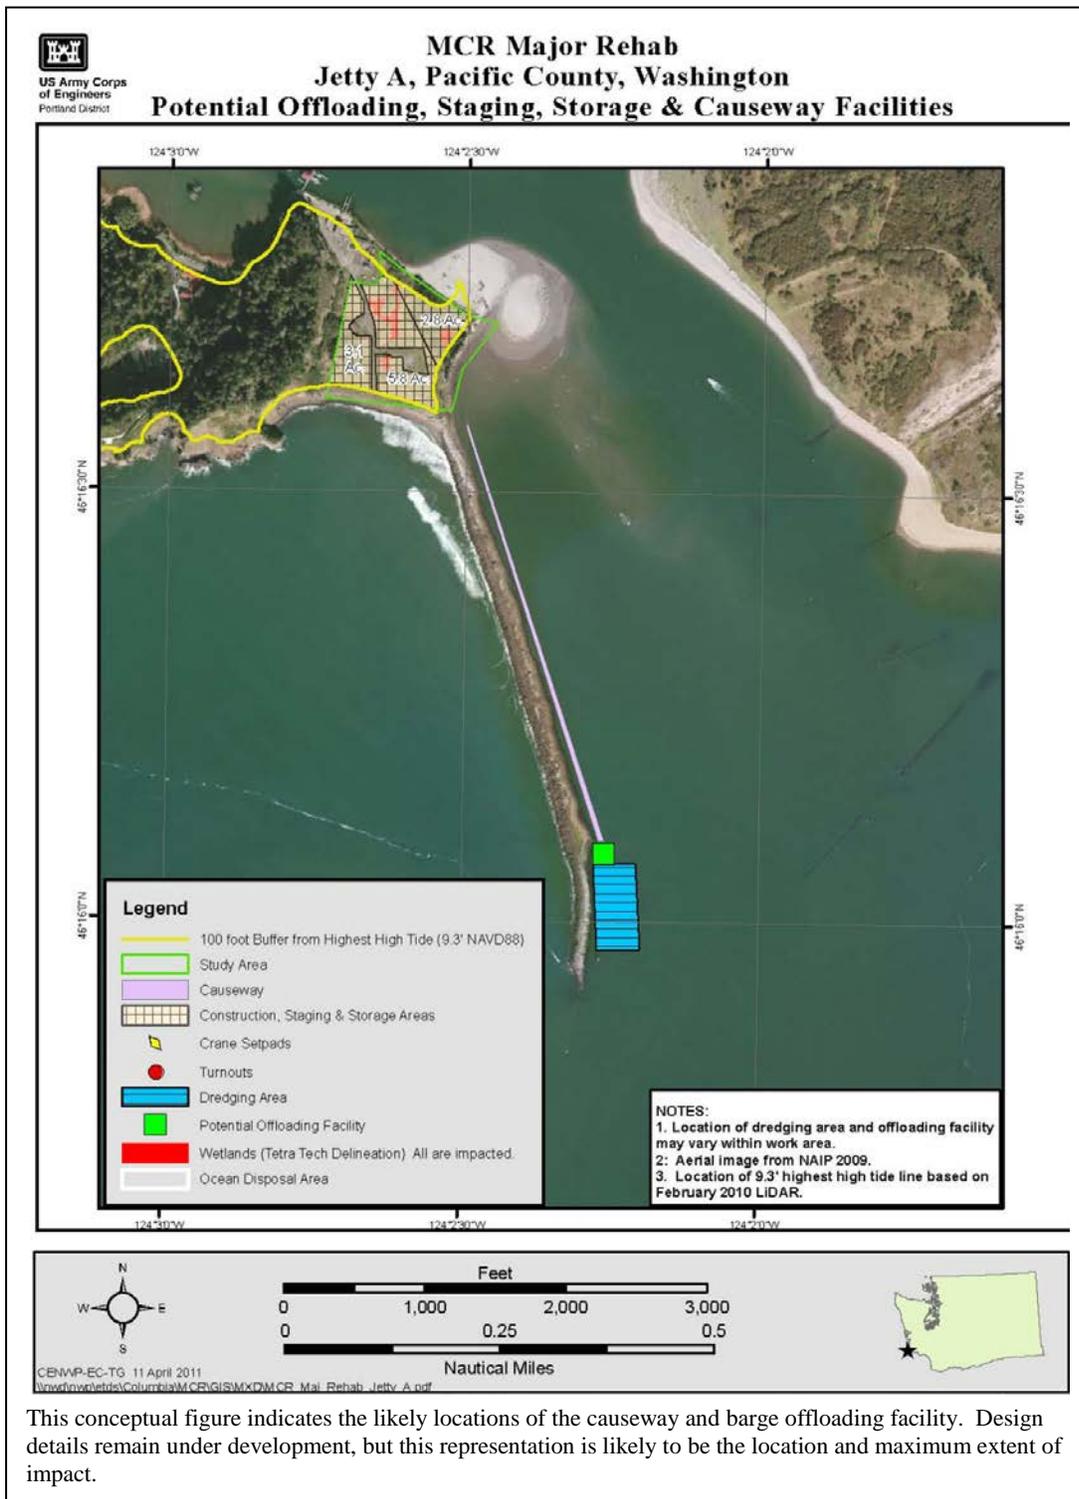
Jetty A Conceptual Causeway and Offloading Facility Locations
